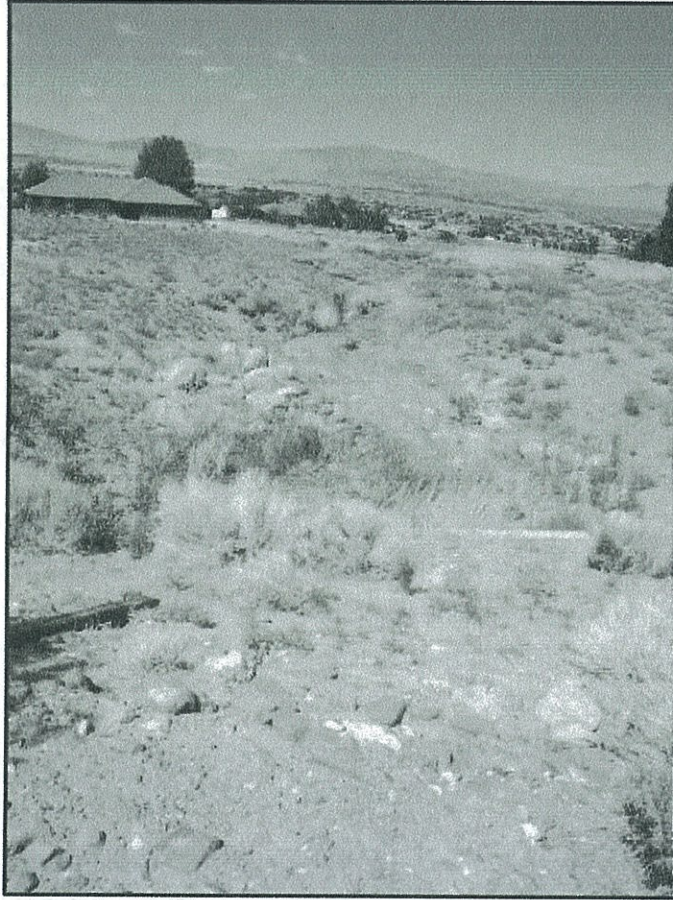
Looking to the west and downstream of the culvert from detention basin in Photo 50.
